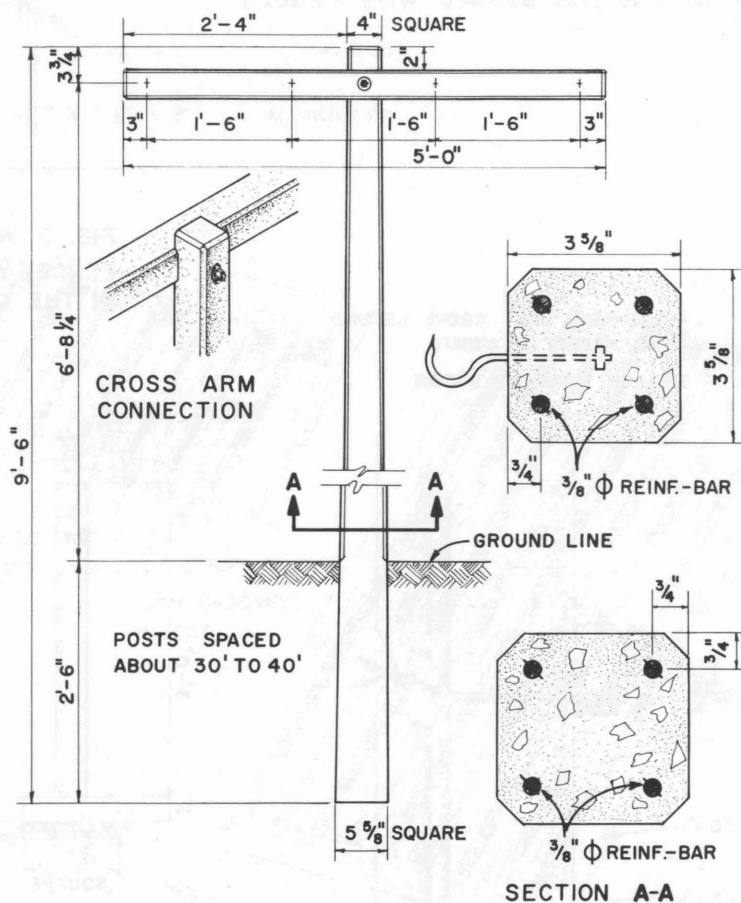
CONSTRUCTION DETAILS FOR CONCRETE CLOTHESLINE POSTS
